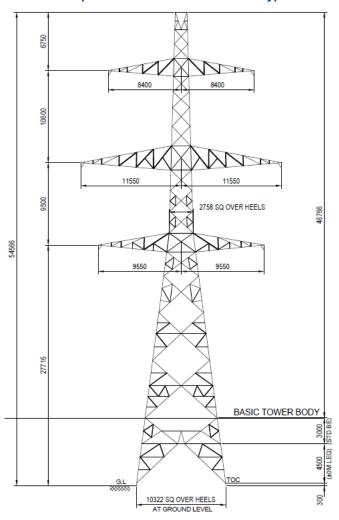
Existing AS4 Steel Lattice Tower Design
